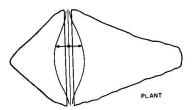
VIBRATION OF EARTH OR ROCKFILL DAM
